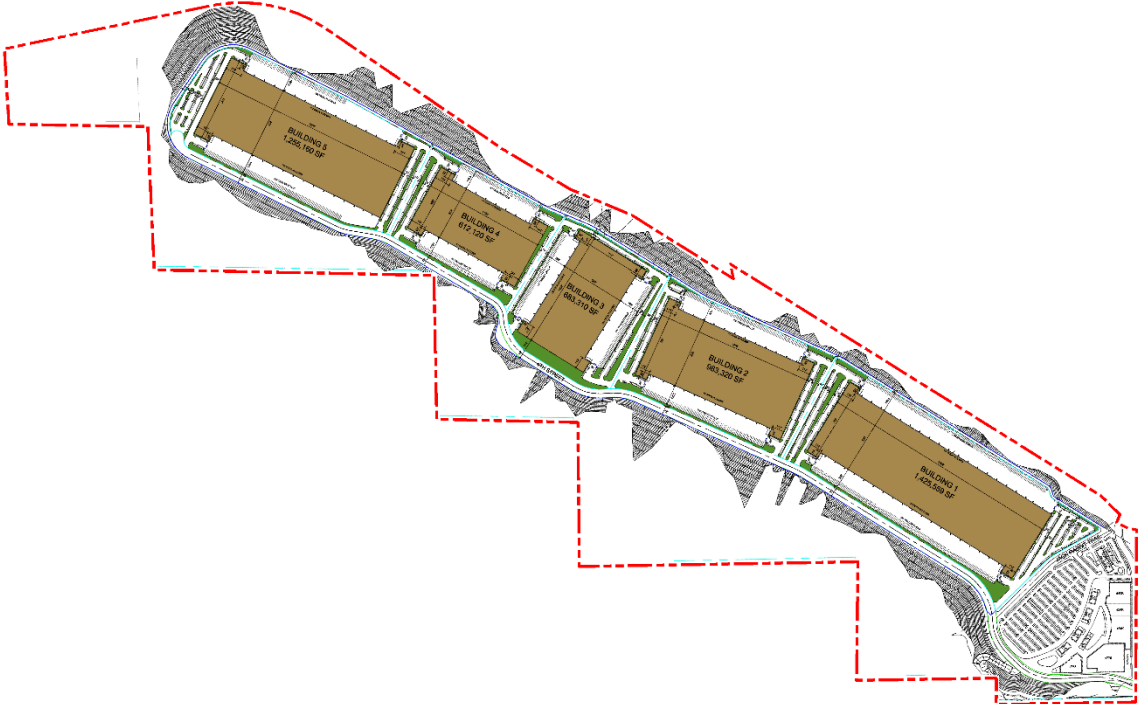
B: CONCEPTUAL SITE PLAN
